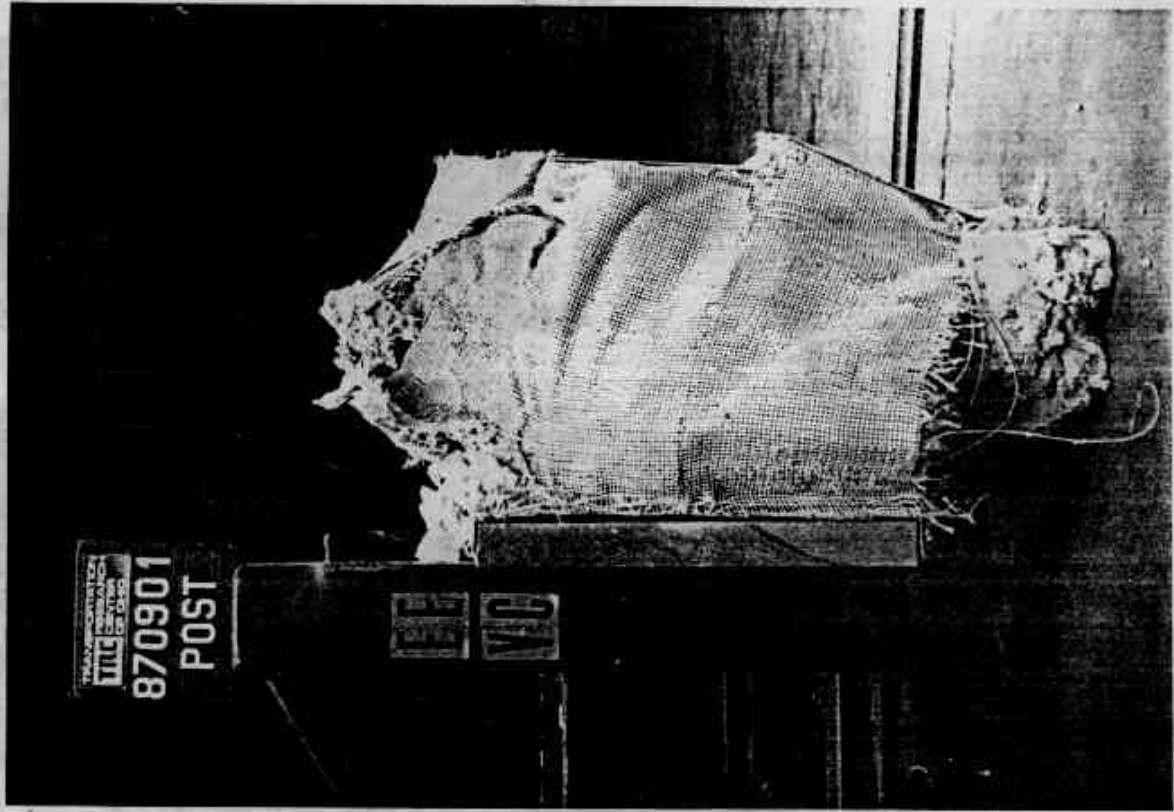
POST-TEST RIGHT FRONT CLOSEUP VIEW
